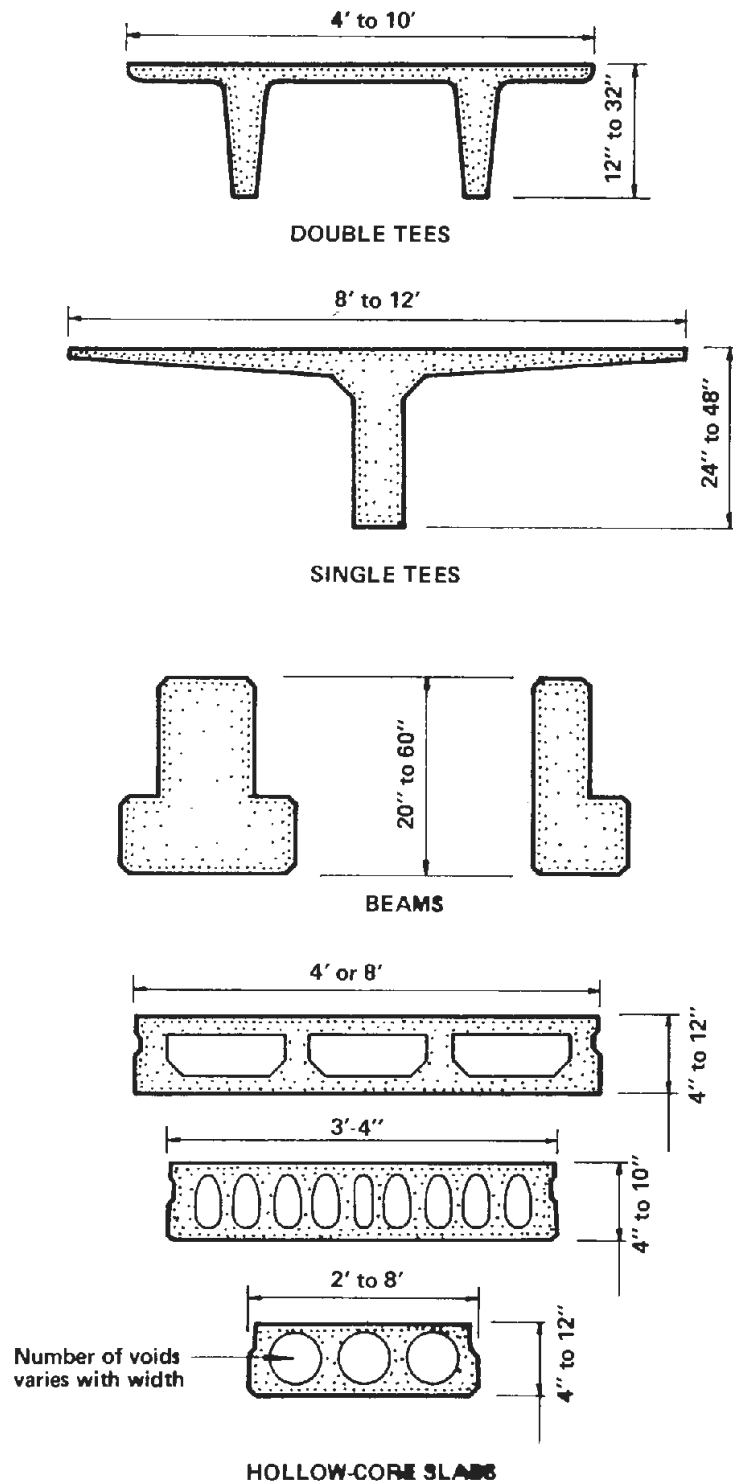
Typical precast, prestressed concrete sections used in buildings. (Courtesy Prestressed Concrete Institute)
